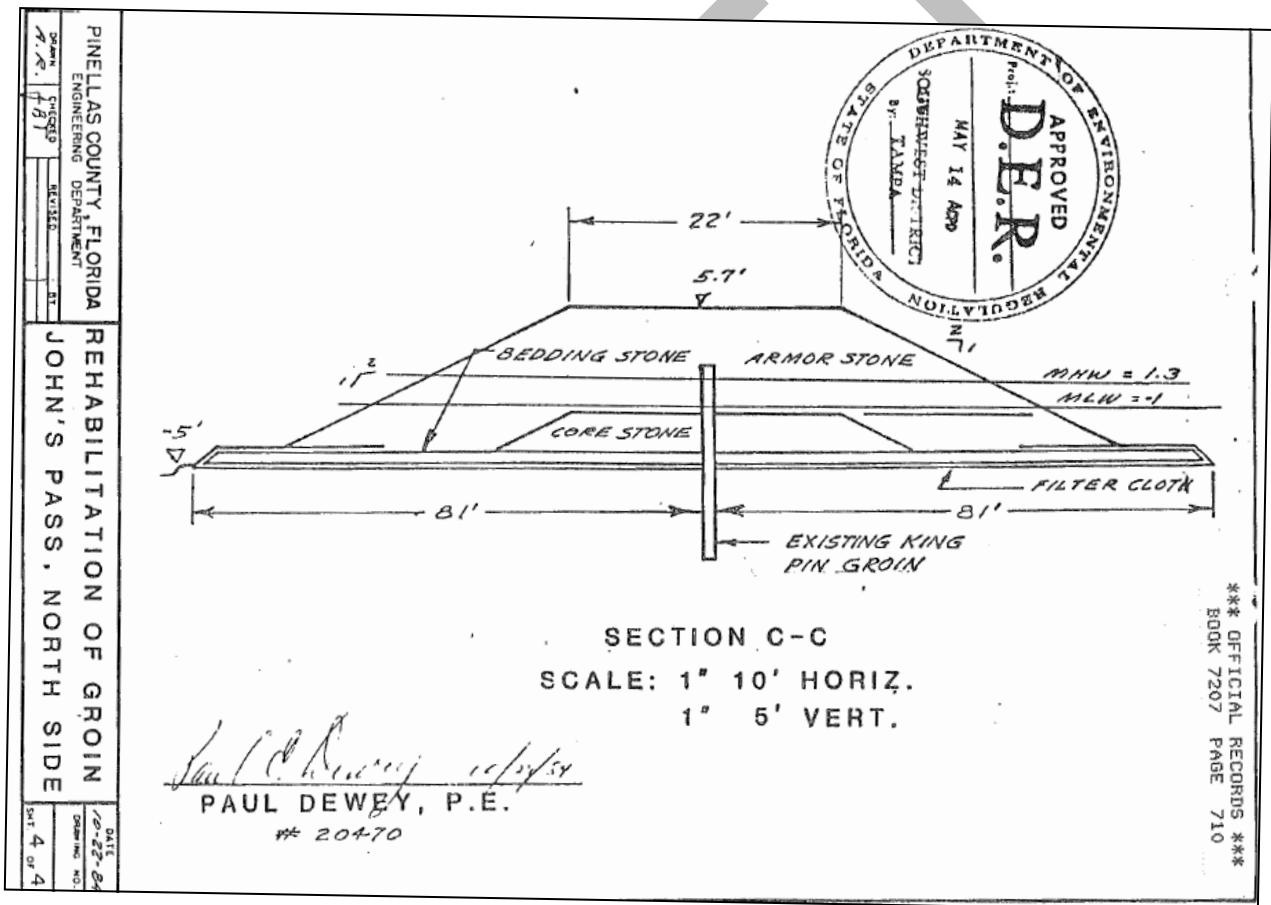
Typical Cross-Section for John's Pass Terminal Groin
